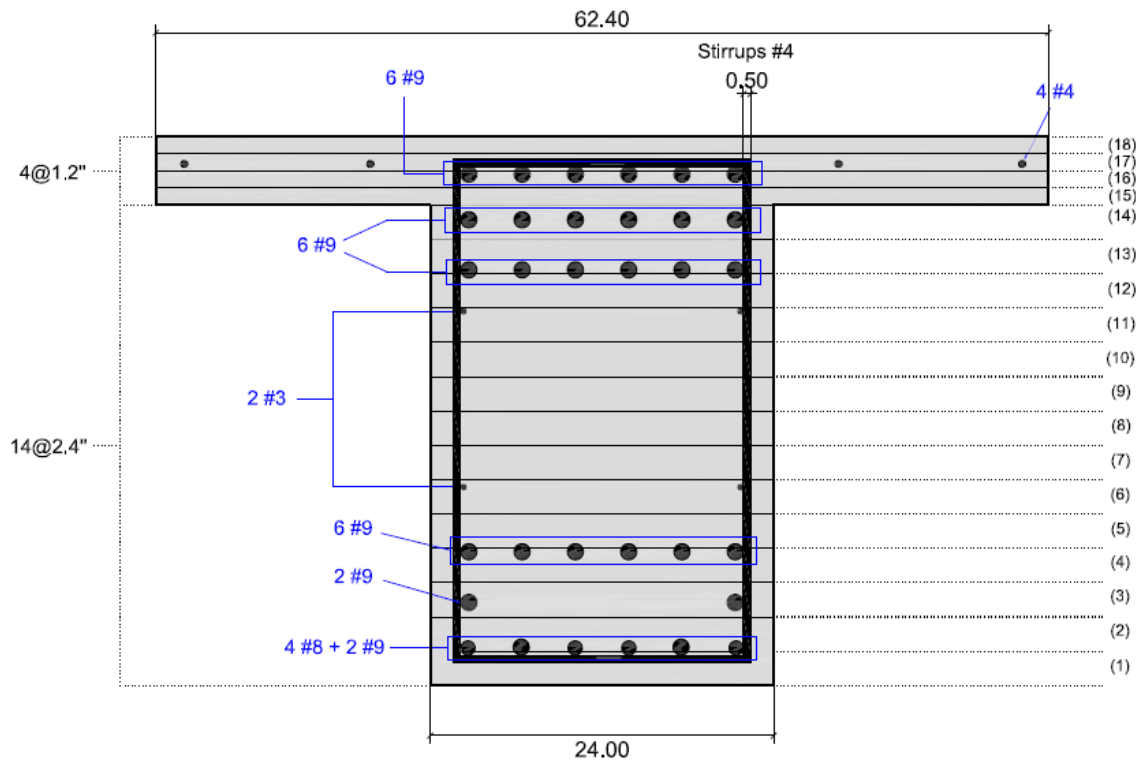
Cross section 4 for Specimen 2. Dimensions in inches.
